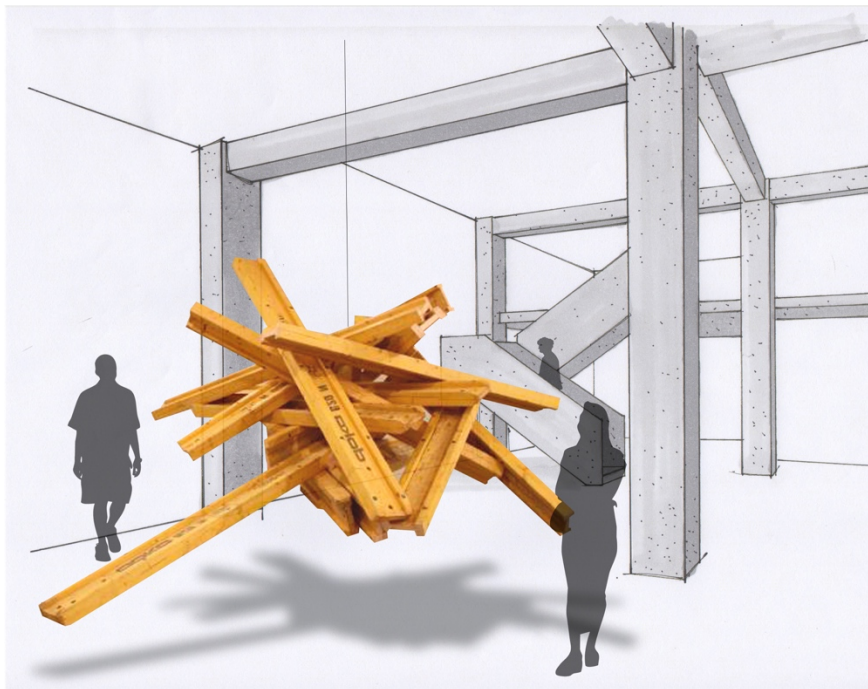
Conceptual sketch of gallery space looking towards the mezzanine.
